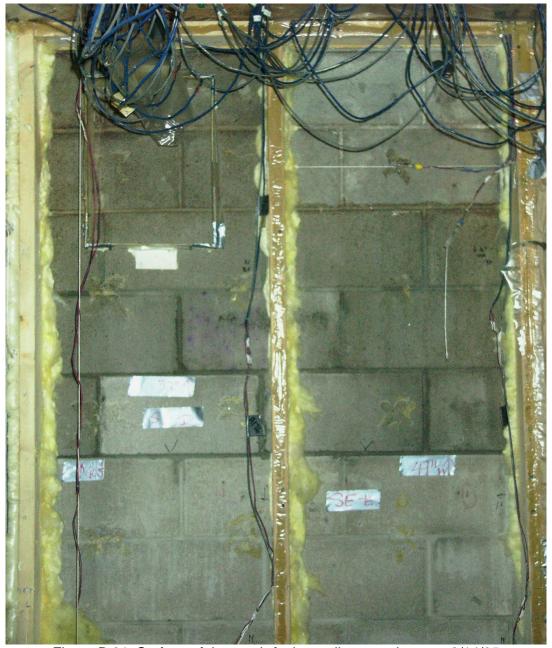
Surface of the south-facing wall at tear down on 2/14/05
